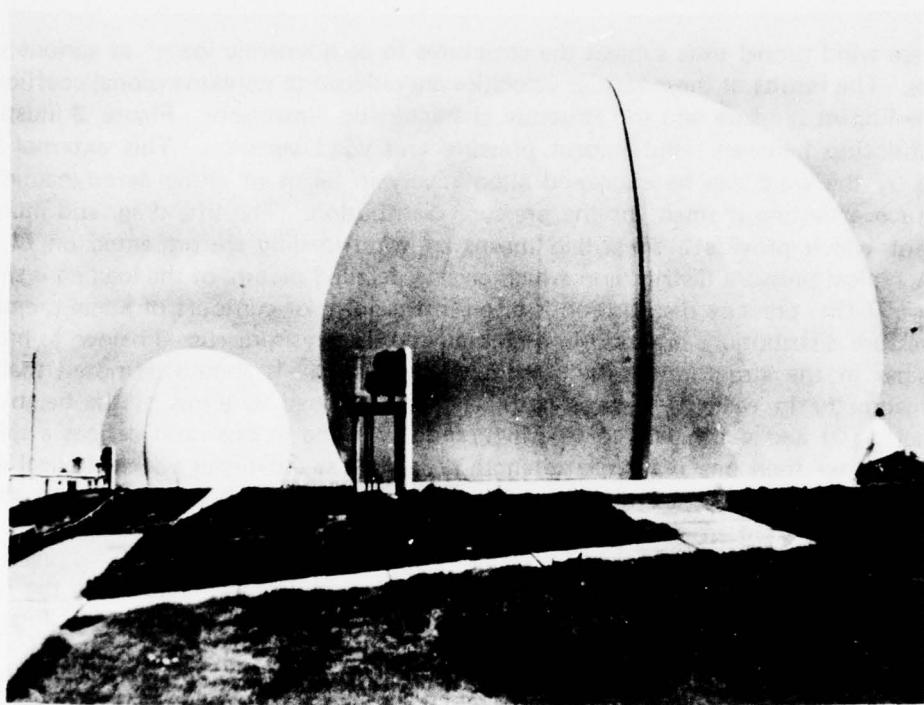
Single-Wall Air-Supported Tent. (Sphere)
